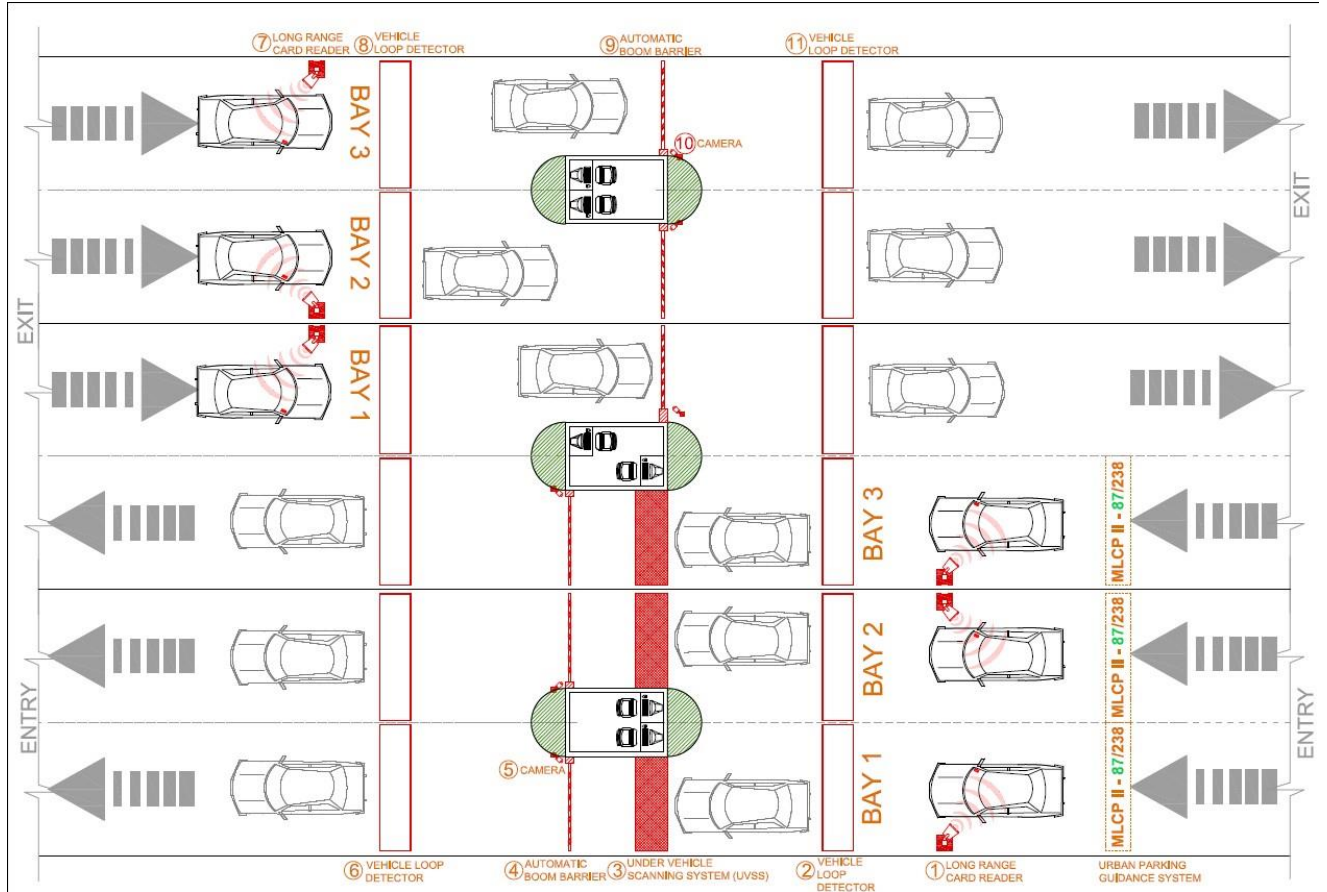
Parking Management & Guidance Schematic at Entry / Exit of Building Basement
